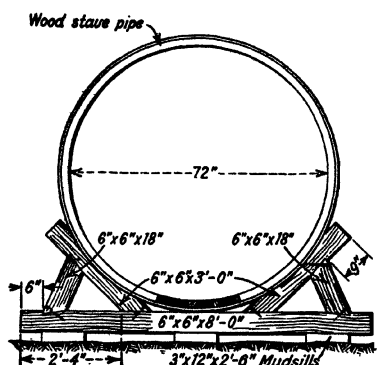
Typical Timber Cradle. Cradles Spaced 12 ft. C. to C. Continental Pipe Mfg. Co.
